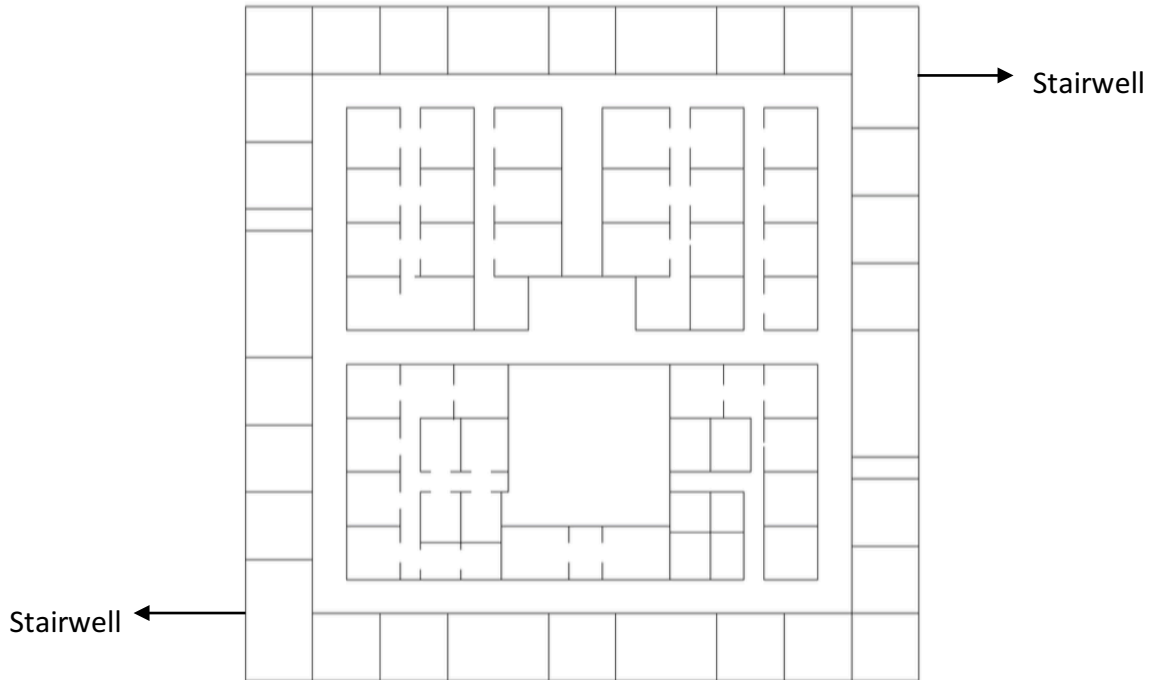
2: 930 m² Building Floor Layout (not to scale) (Hartmann, 2005).
